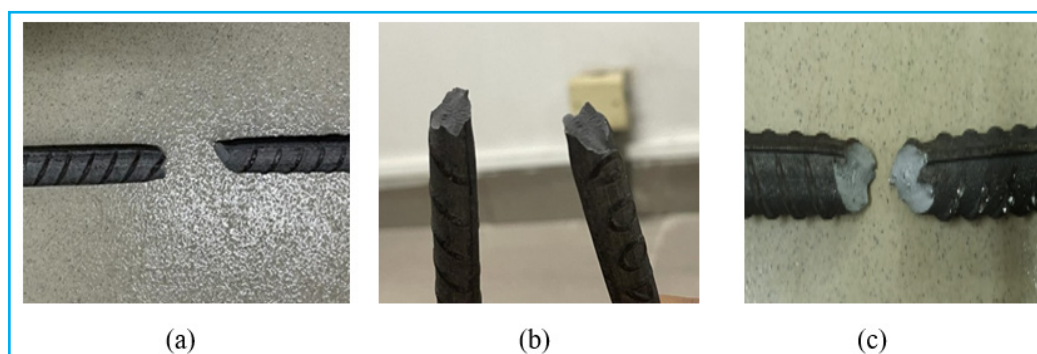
Failure of (a) 12 mm, (b) 16 mm, (c) 20 mm of 60 grade rebar
